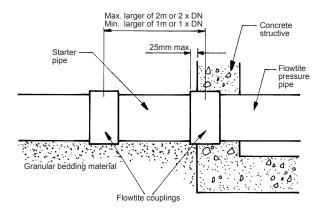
Standard connection. Coupling cast in concrete for pressure applications.
